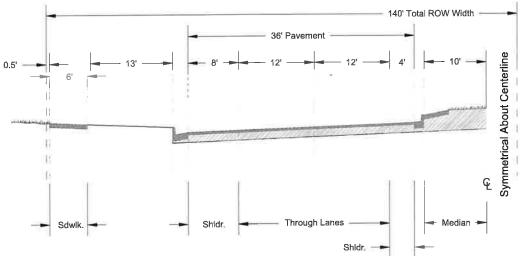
Typical Urban Expressway Cross Section (4 Lane)
